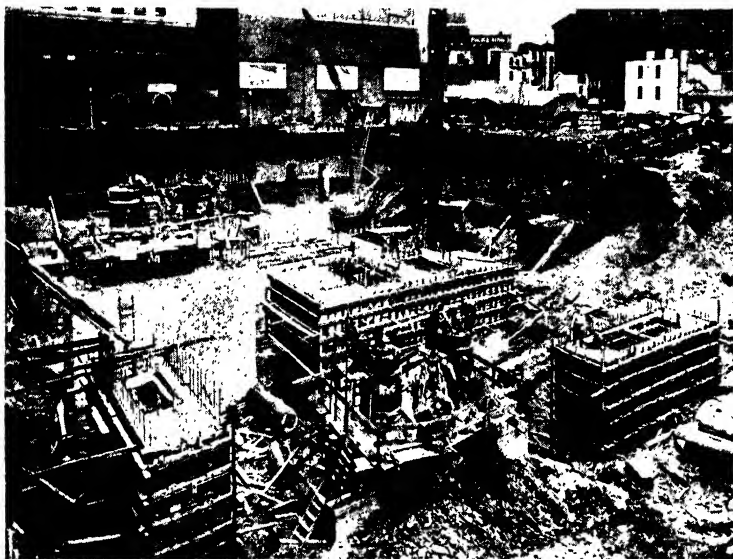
Pneumatic caisson piers for Gulf Oil Building. Note mud locks in foreground.
